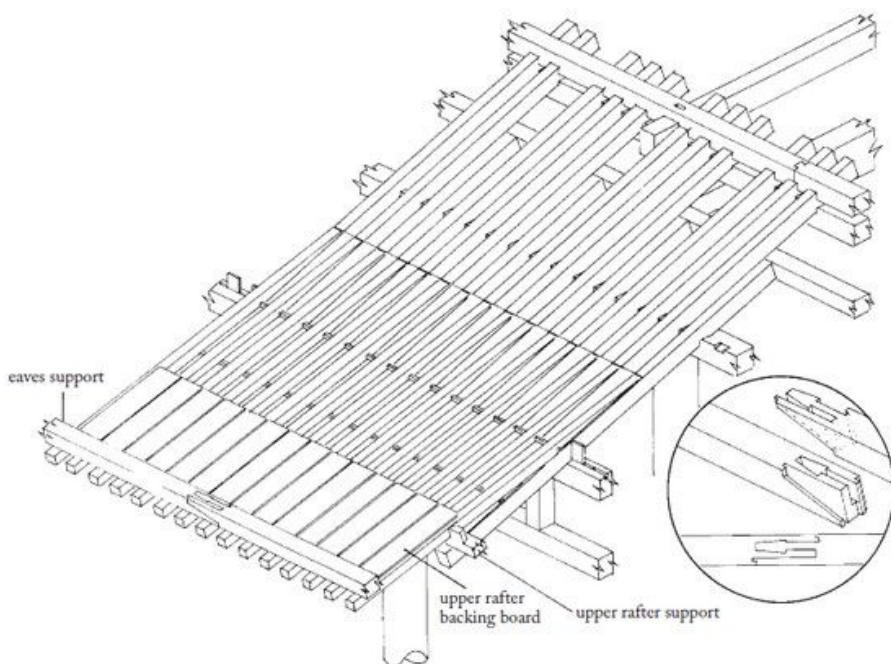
Assembly of the upper rafter backing boards and eaves support. The inset shows a splice joint on an eaves support.
